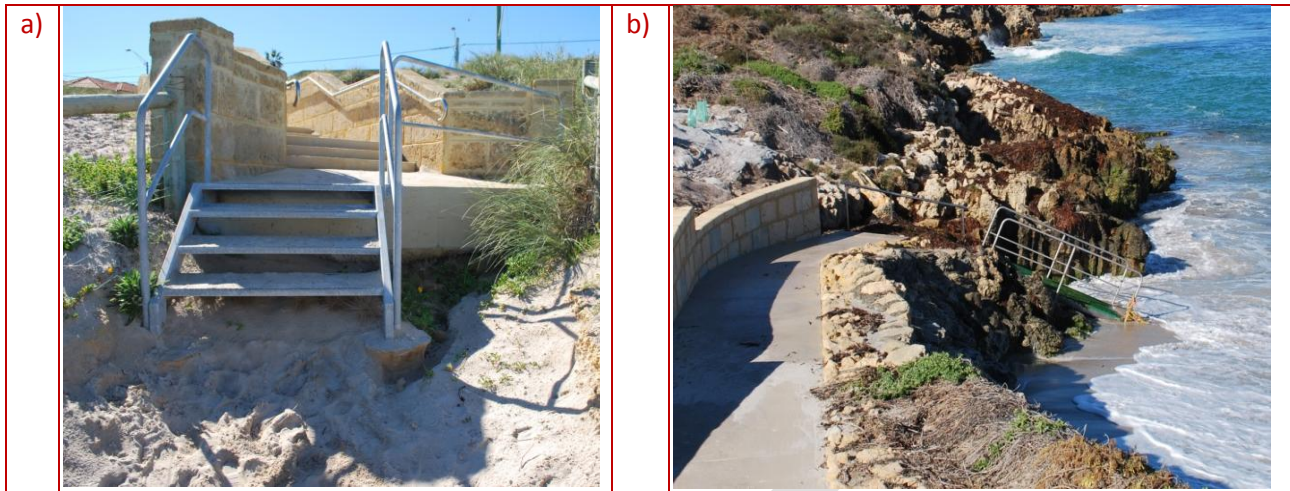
Beach access: a) erosion apparent at end of beach access stairs, b) adjustable ramp near MAAC
